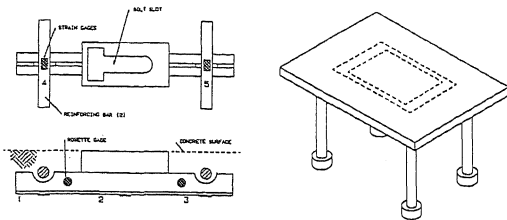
Typical Wedge-Insert and Weld-Plate Connections
